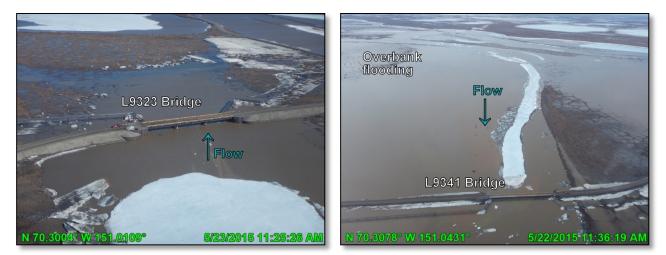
Lake L9323 Bridge following peak flooding, looking north toward connection with Nanuq Lake; May 23, 2015
